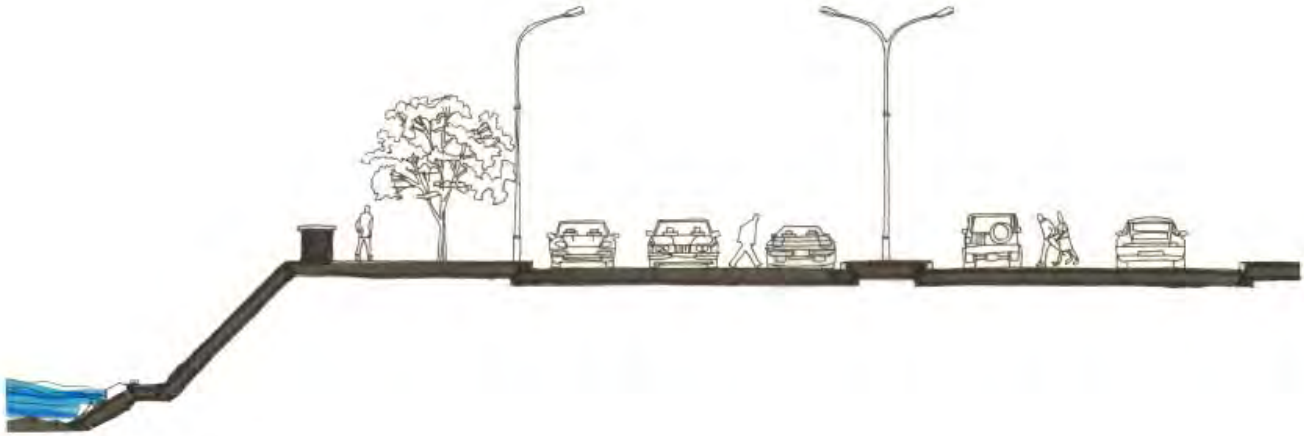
Existing section A-A': Typical sidewalk in CBD next to steep cement banks blocked by walls
